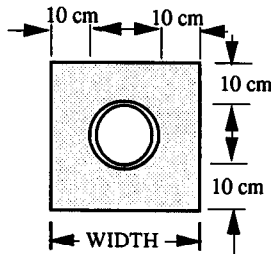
Excavation amounts for various trench widths and depths and 100-millimeter gravel envelope amounts for various pipe sizes (metric units). Drawing 103-D-684.
